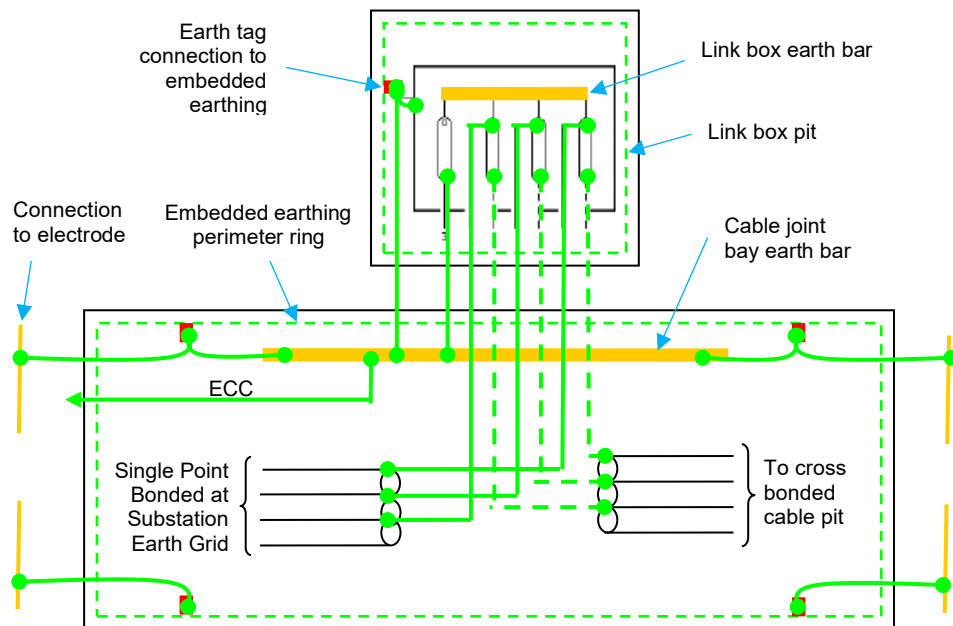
Single point bonded cable joint pit schematic – screens bonded at pit
